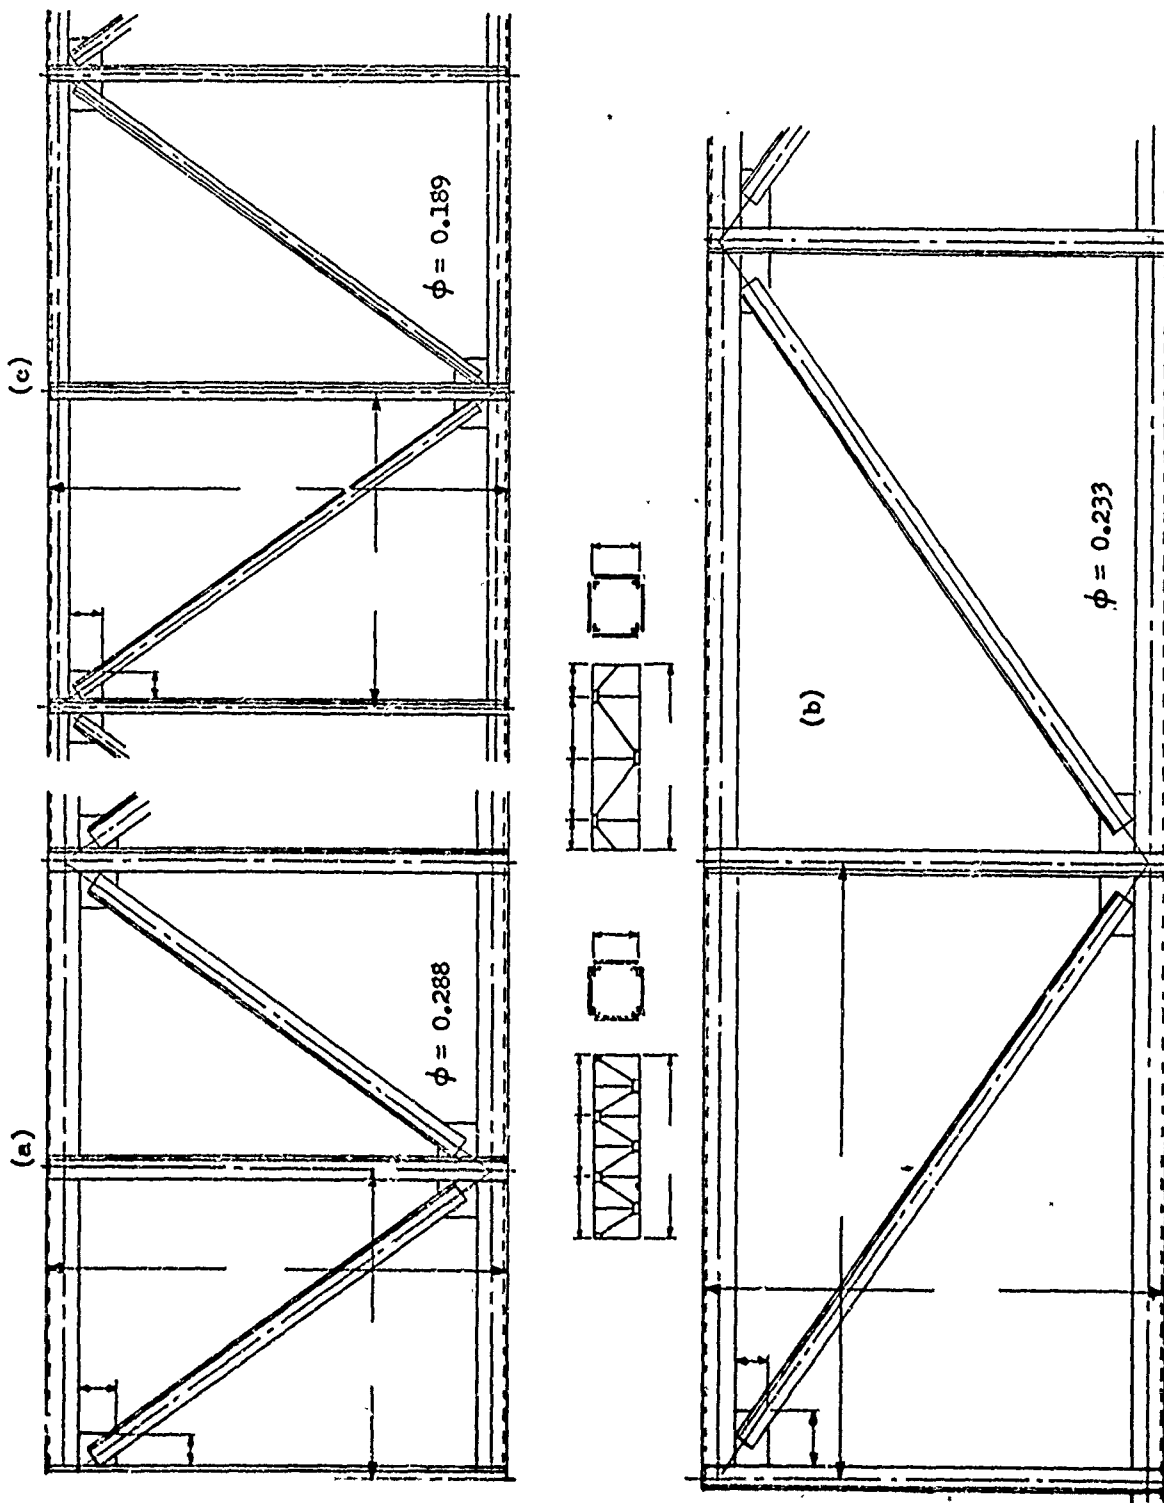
Three models of box-work structures with quadratic cross section and N-type bracing. Note: All bars have N cross section
